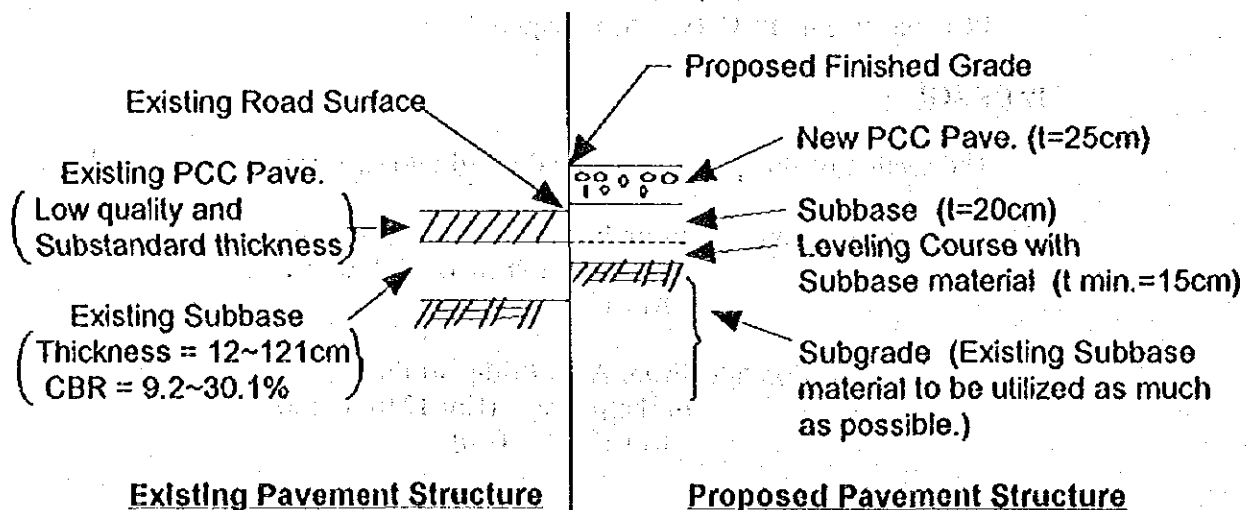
PROPOSED PAVEMENT STRUCTURE: PACKAGE 6
